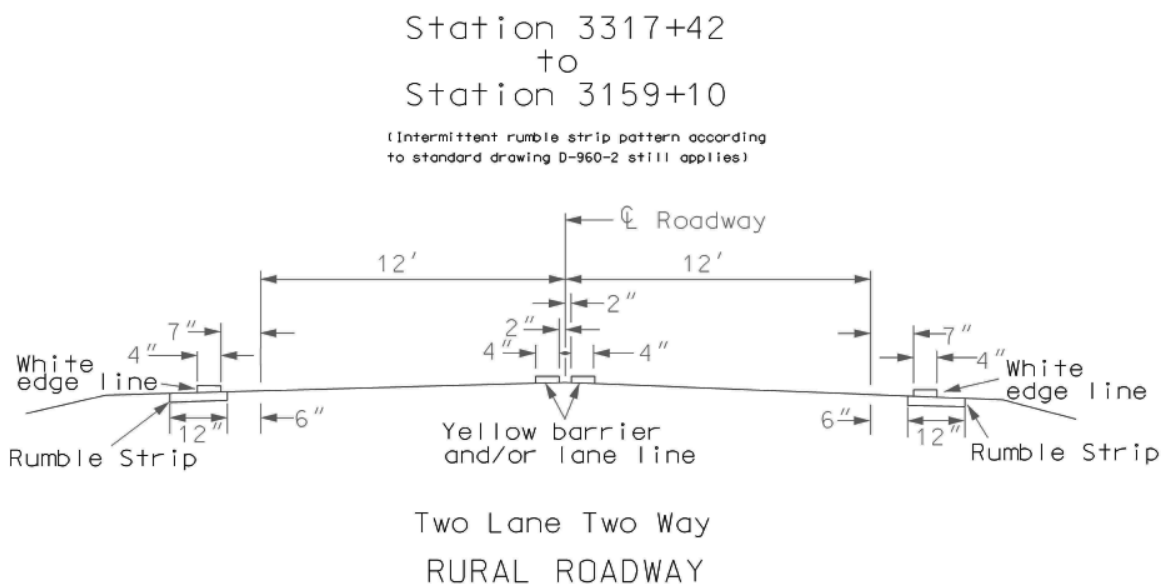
Drawing of the placement of edge lines and rumble strips in the test section.
